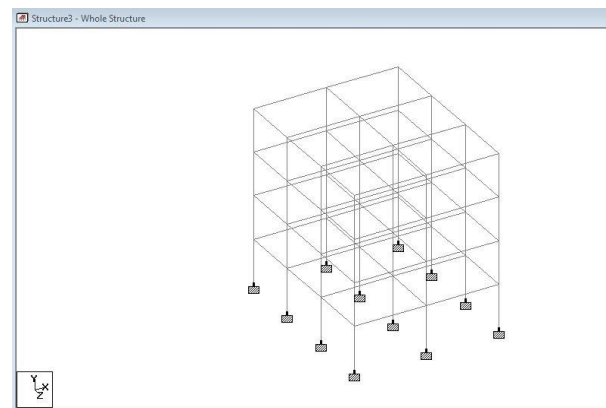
CASE-III OF PARTIAL CONSTRUCTION FRAME [Building constructed up to fourth floor]
